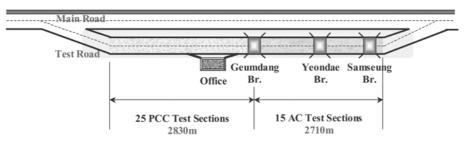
KHC test road on Jungbu Inland Expressway in Korea
